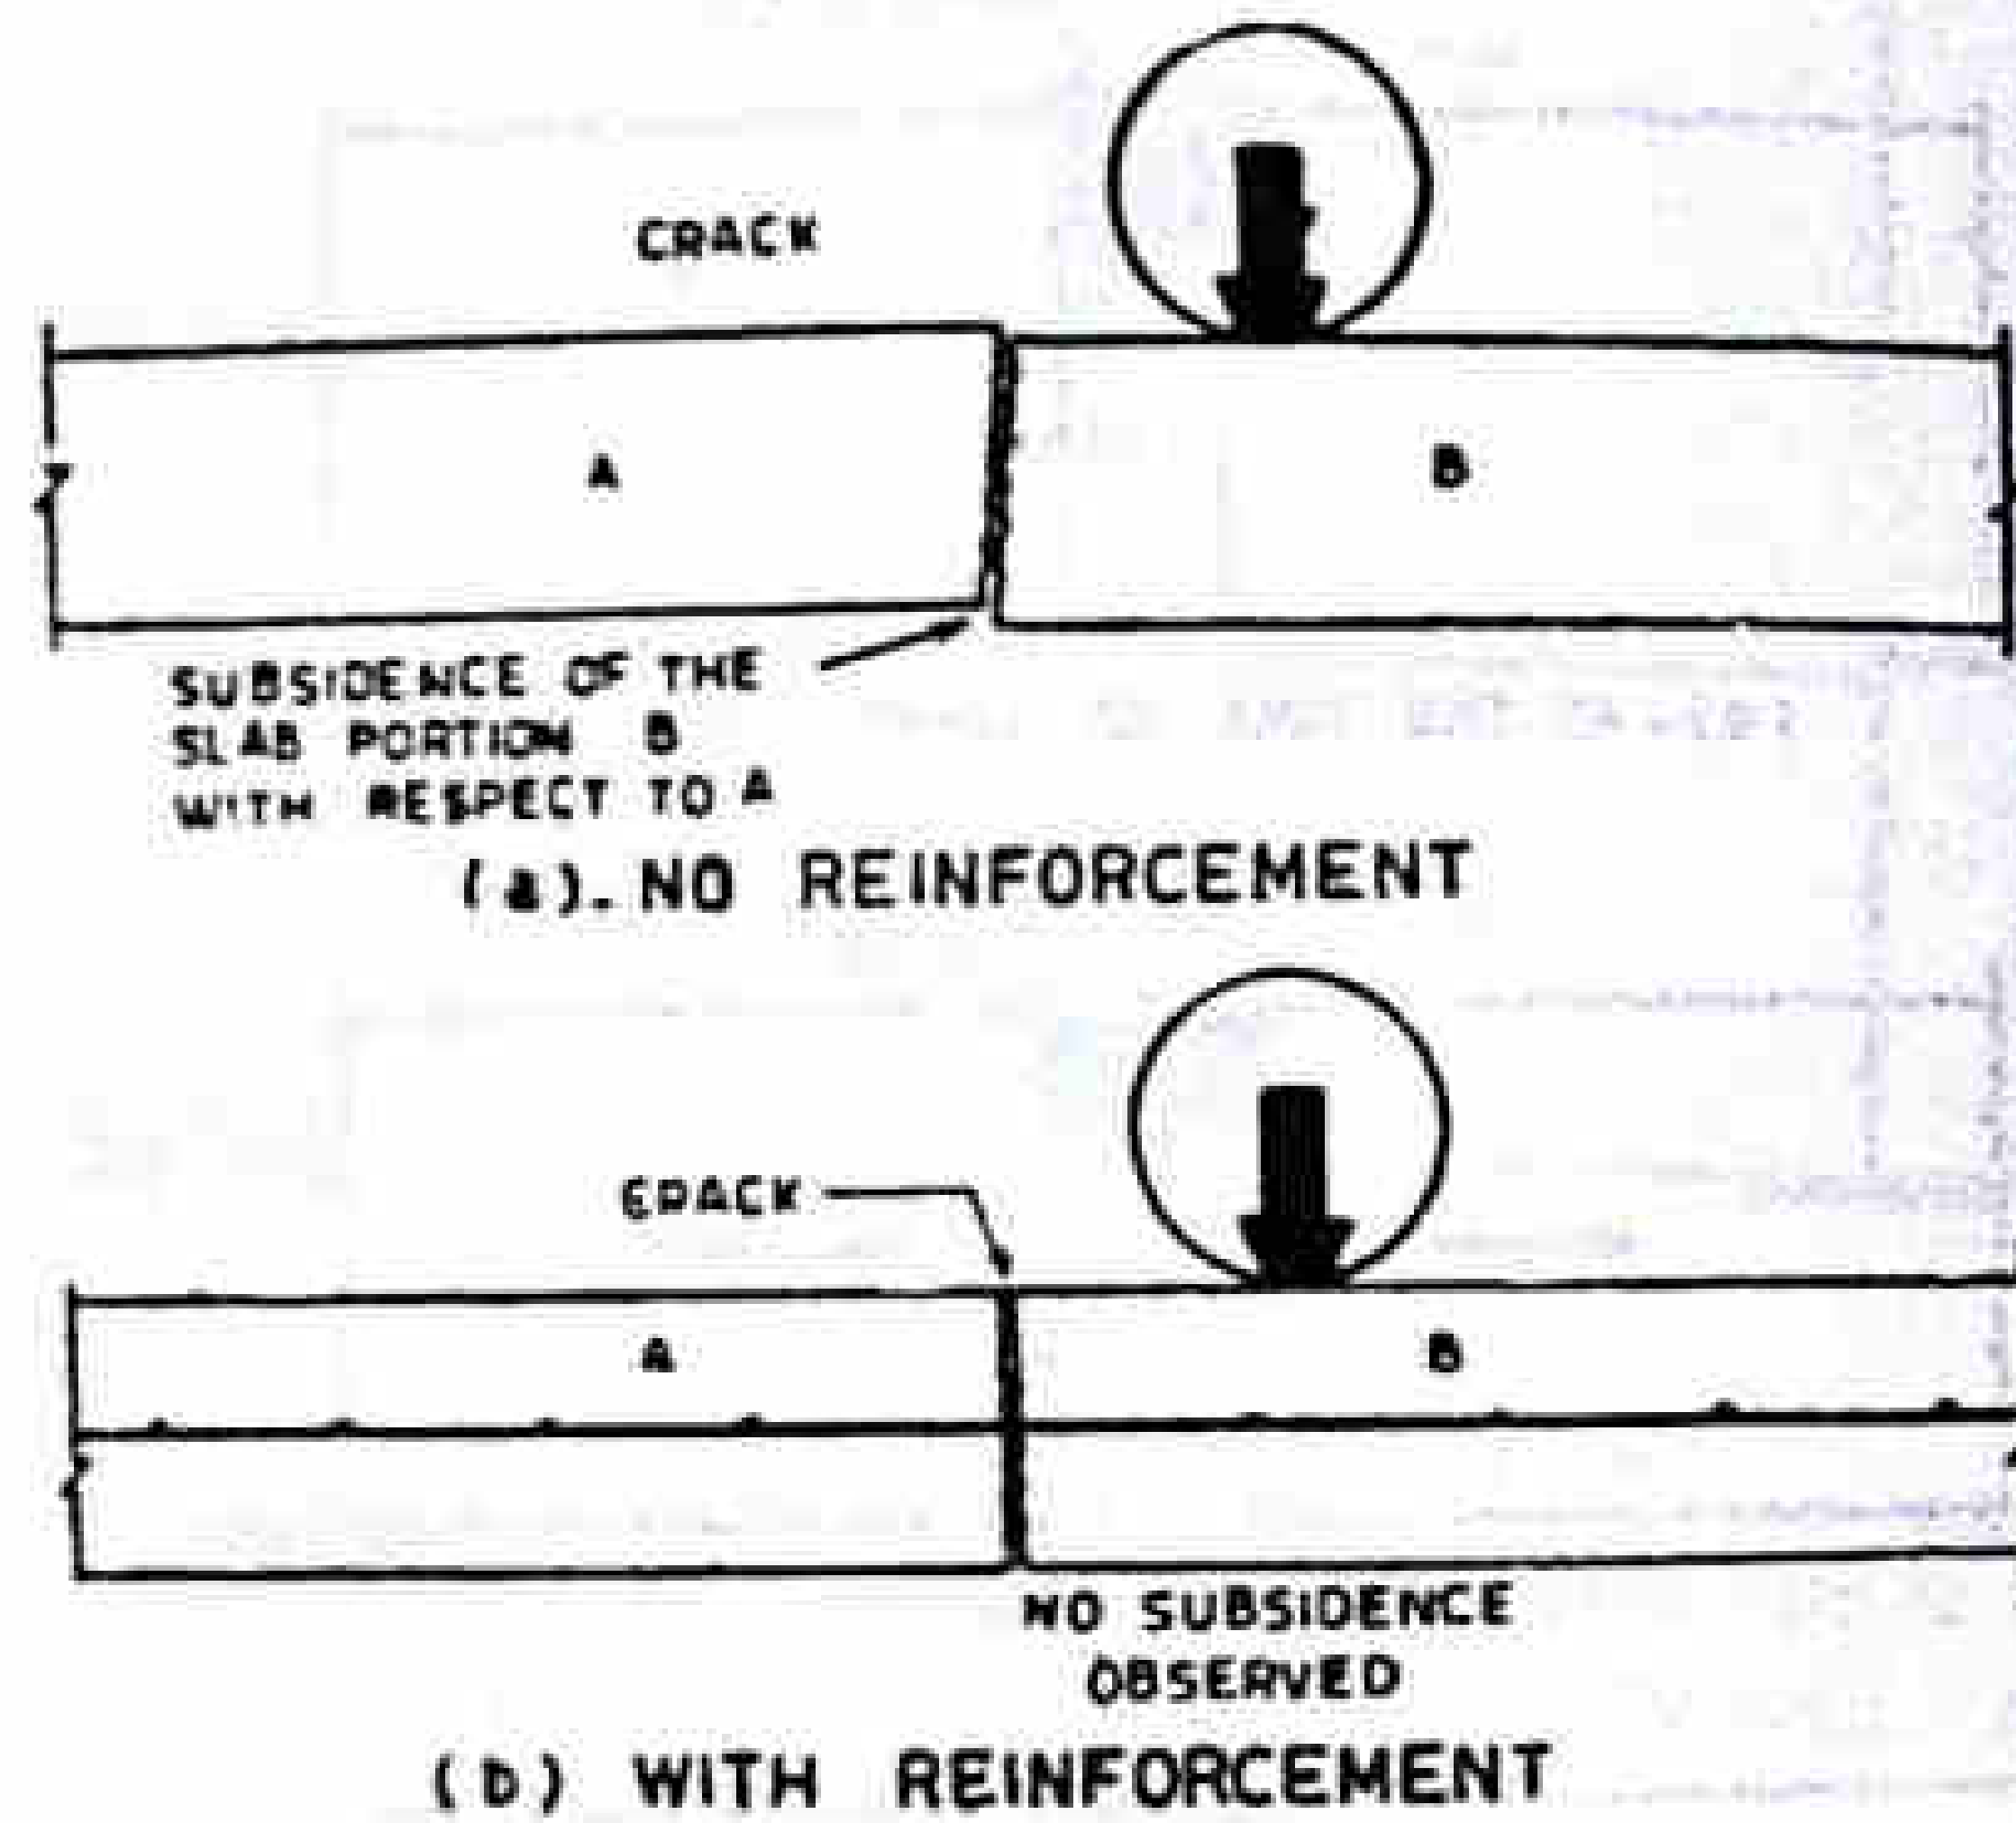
Effect of Reinforcement in Concrete Pavement
